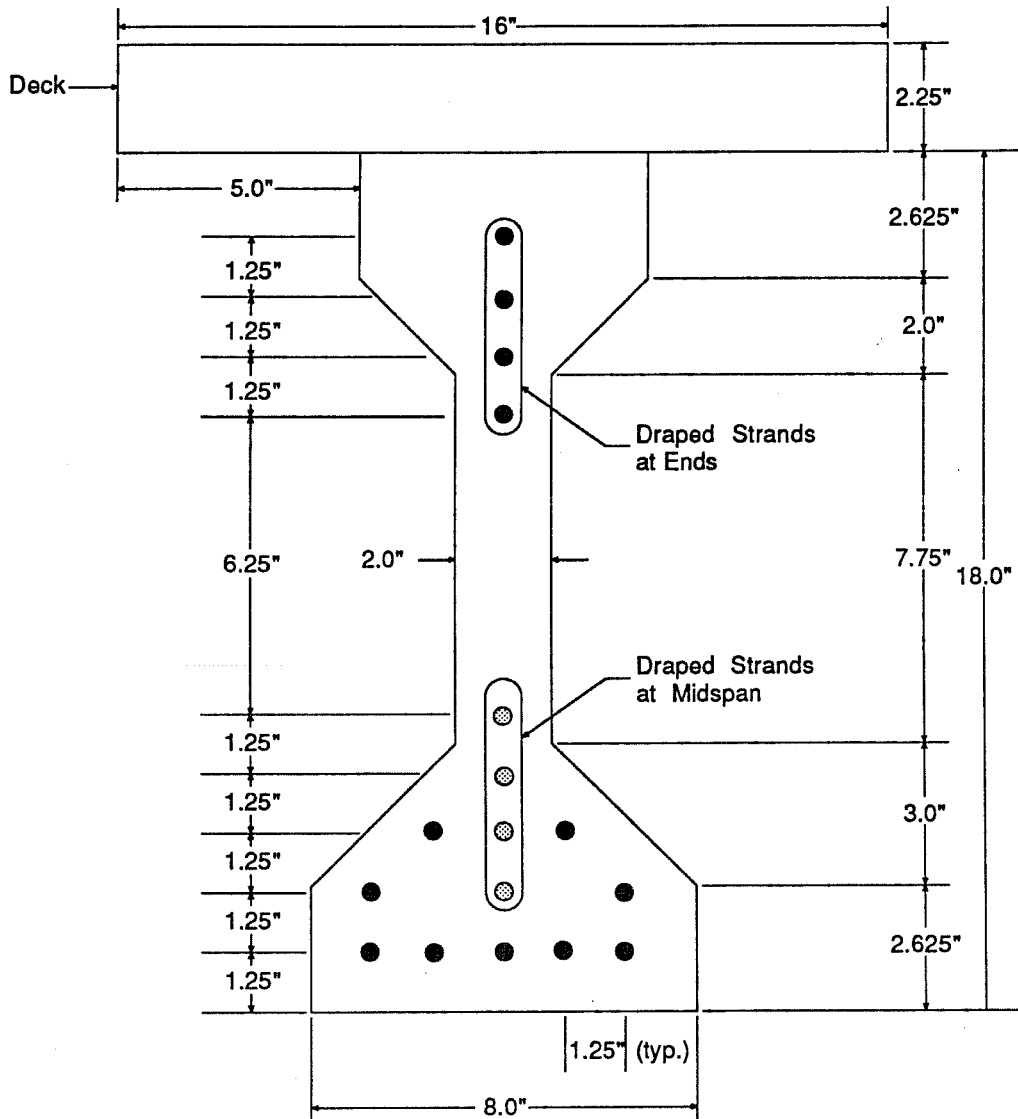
Cross-section and strand locations for Specimens 3-1 and 3-2.
